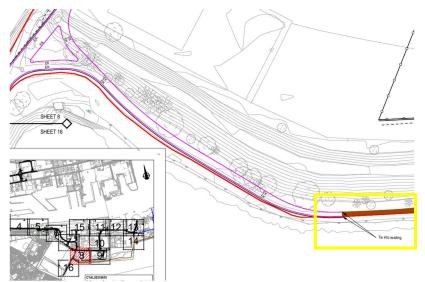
Excerpt from Roads & Footways (Southern & SPAR) - Proposed General Arrangement Sheet 8 (Source: Dwg. No. CP1901_3FM-RPS_S26-HGN-XX-DR-HE-100-0008)
